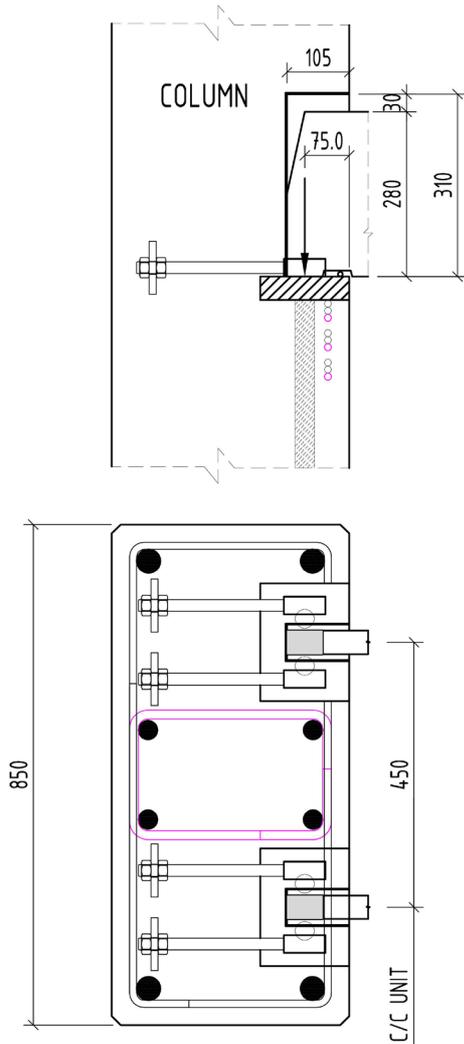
BSF700 column unit. (Reinforcement is not illustrated complete.)
